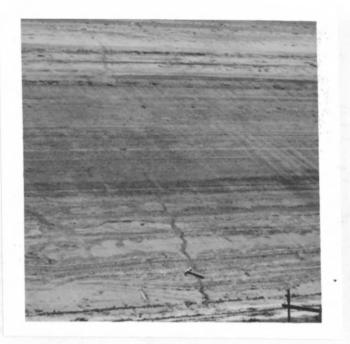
Crack filling at station 1929+40R. Photograph by Merritt Bradley, U.S. Bureau of Reclamation.
